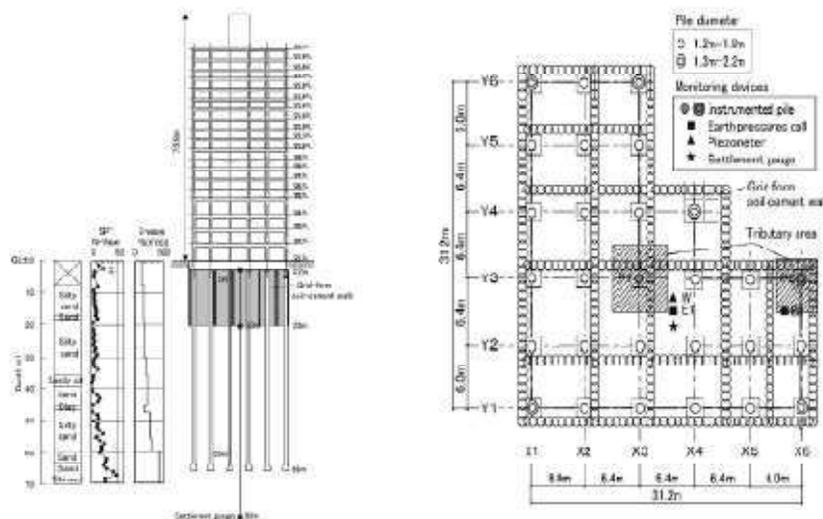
Soil profile, foundation plan and elevation of nineteen story residential tower (after Yamashita et al., 2011)
